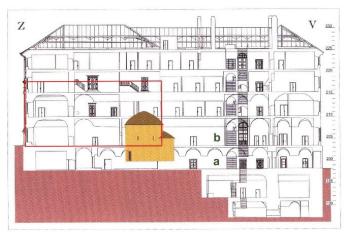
Section of the building No. 2 / III with the marked height positioning of the rotunda masonry. Reconstruction by J. Čiháková and M. Müller¹.
